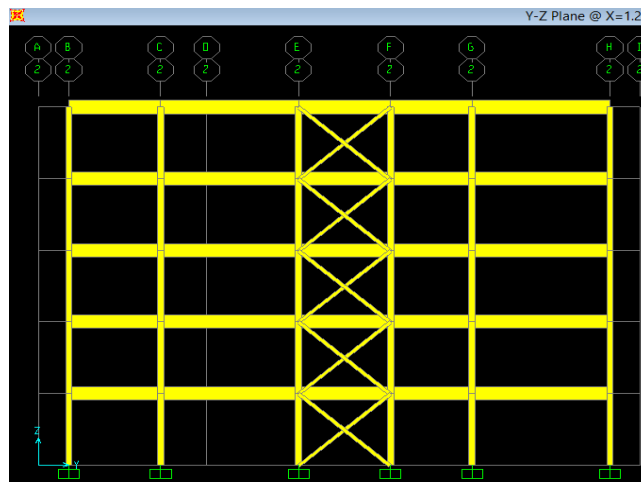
Modeling of steel bracing in direction YZ at X=1.2 m
